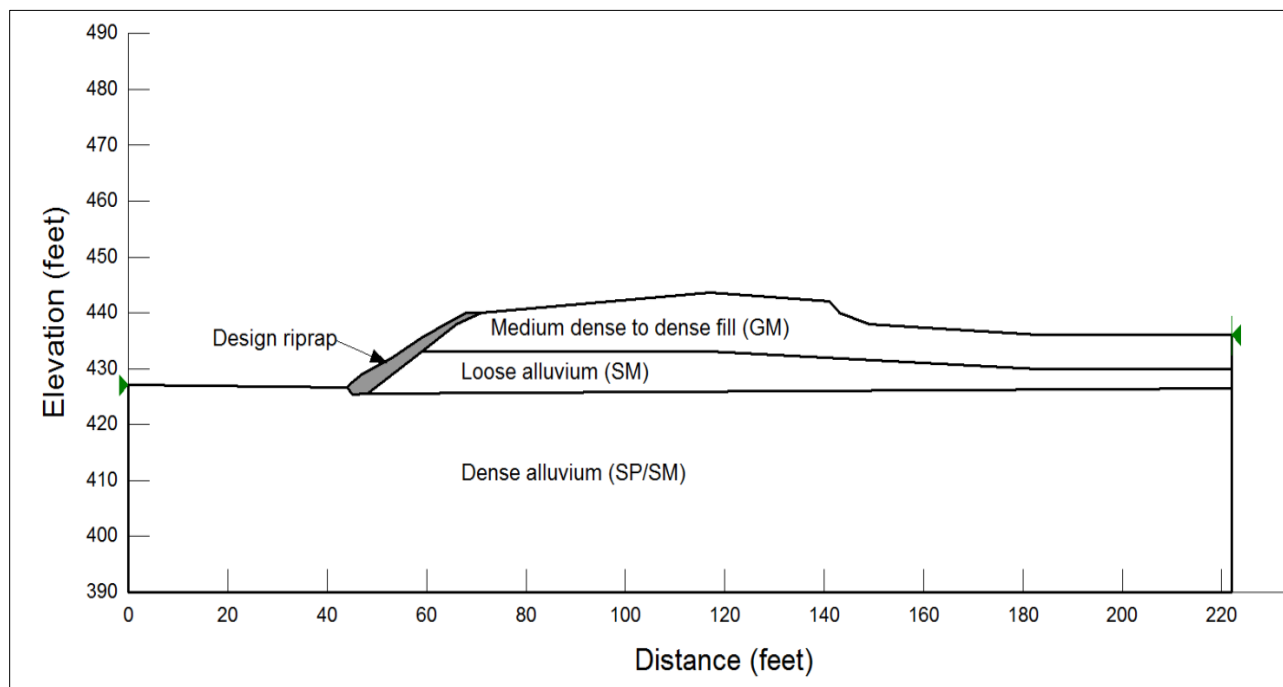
Levee Cross Section, Critical Section Location G-15
